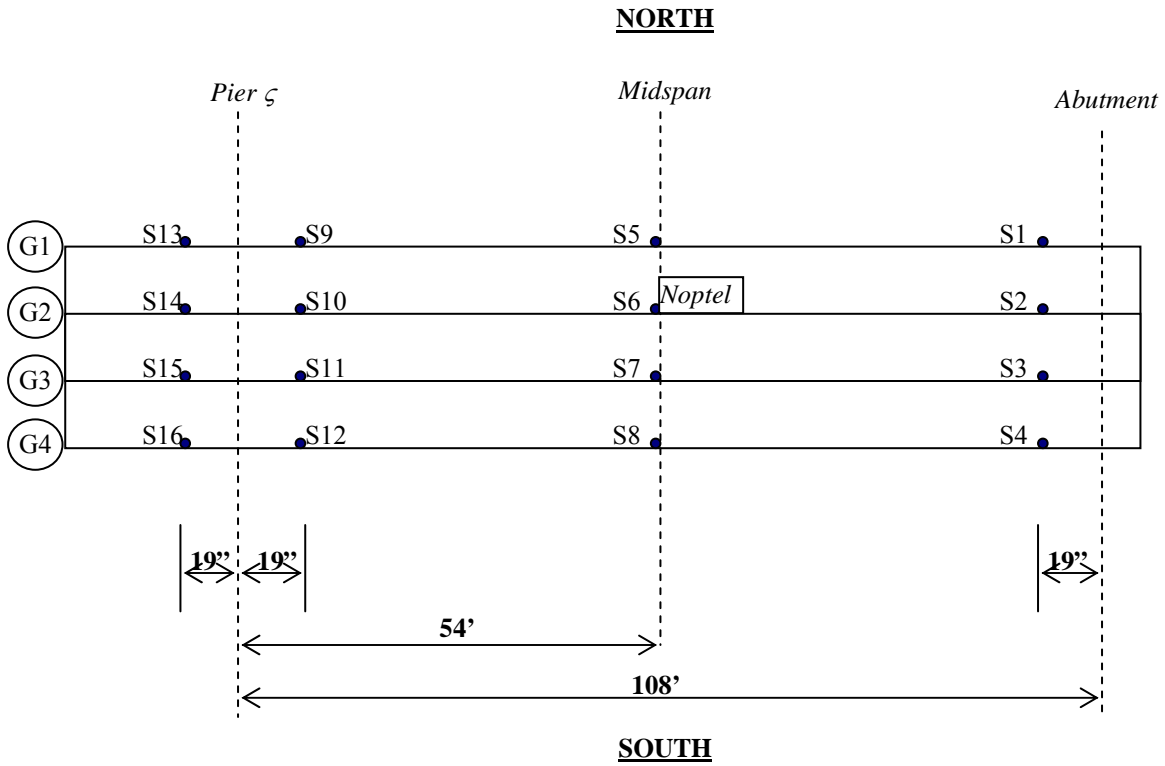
Strain Gage Location in East Span of Bridge (S01-12034)
